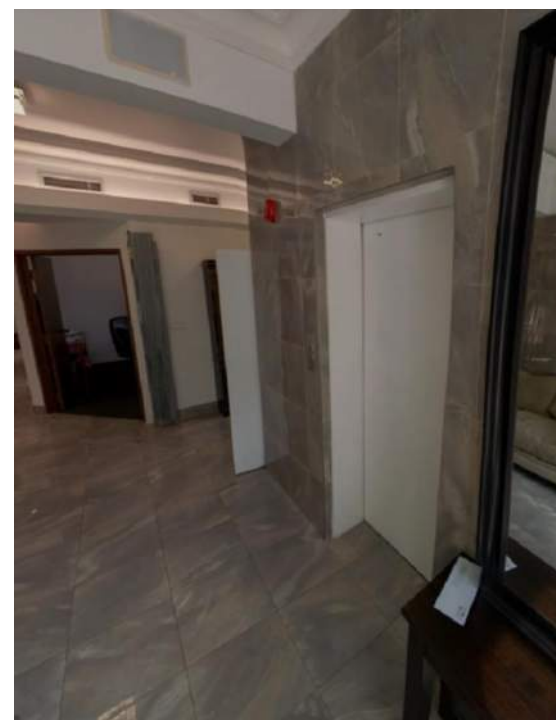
DOOR AND FRAME TO BE REMOVED
